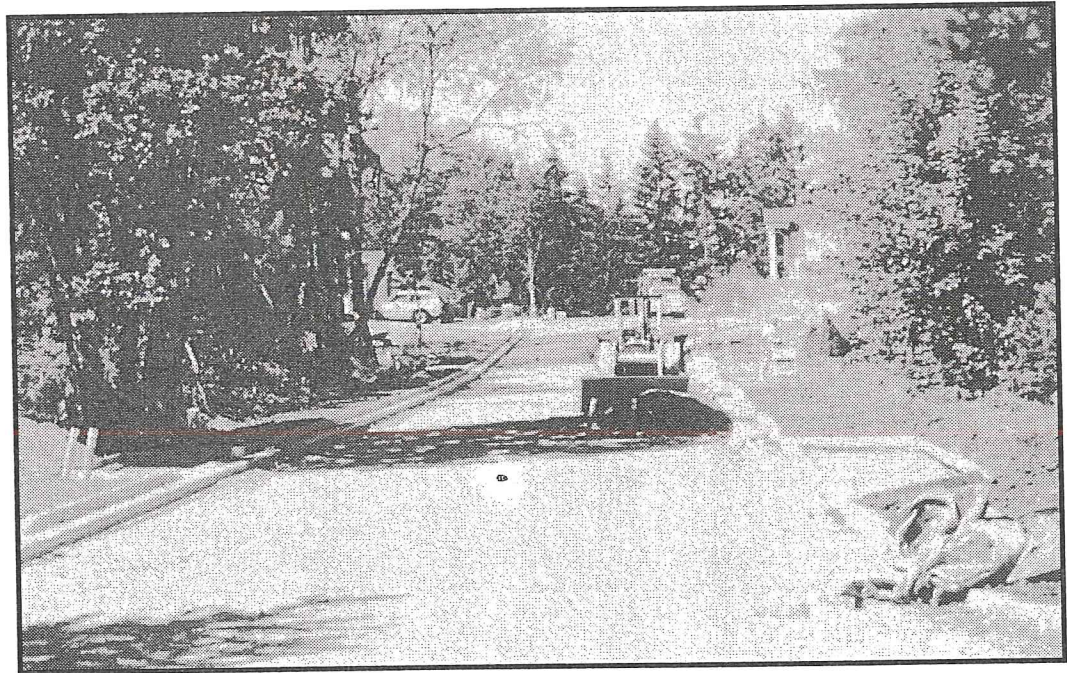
Road construction on Lambert Street South in West Eugene.
